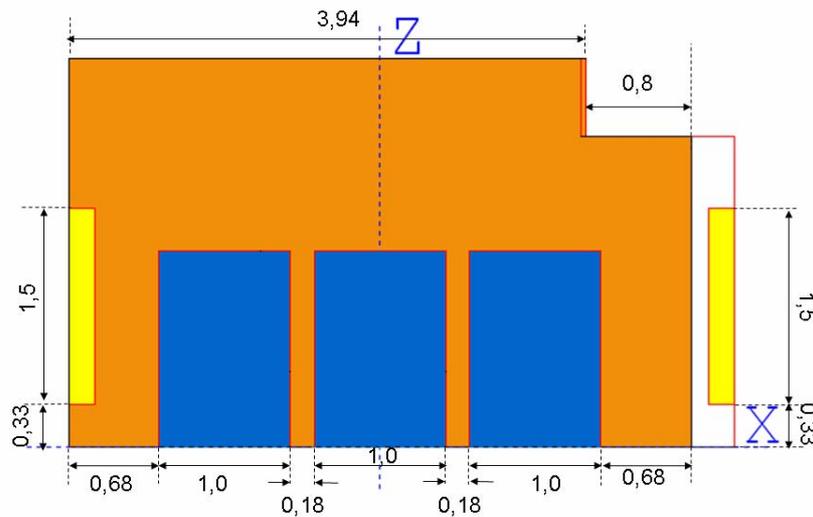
Window perspective of the listening room without step ceiling with all necessary absorbers
